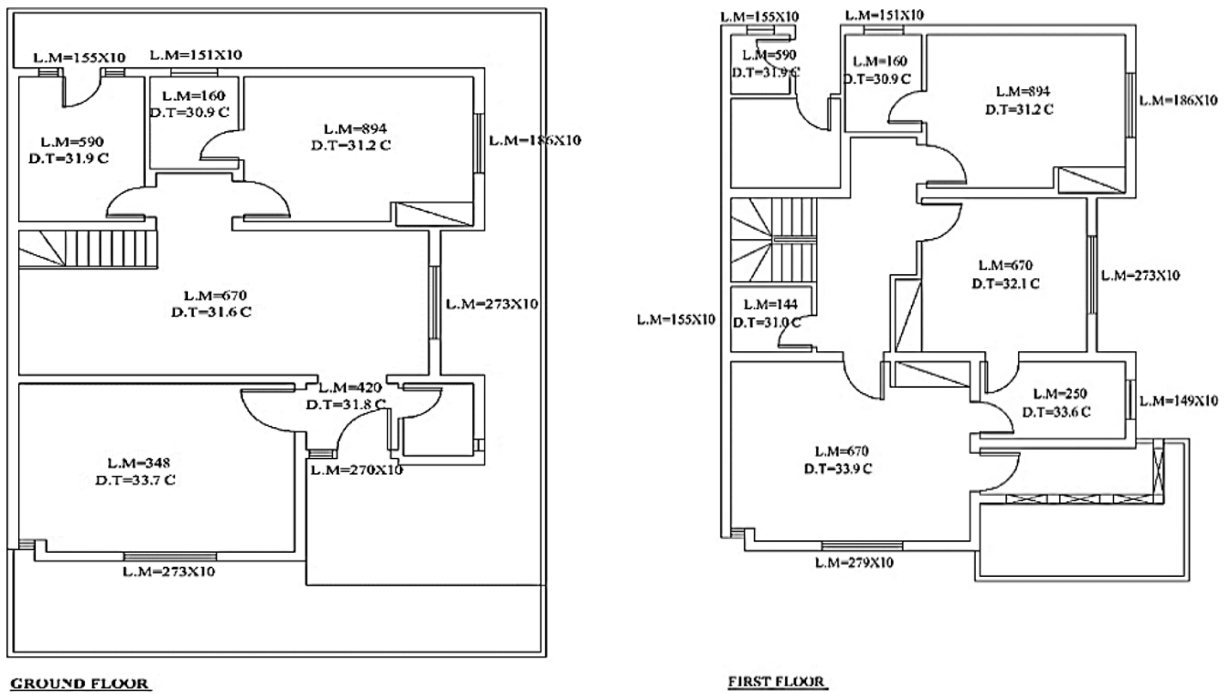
DETAILED ARCHITECTURAL PLANS OF 7 MARLA HOUSE
